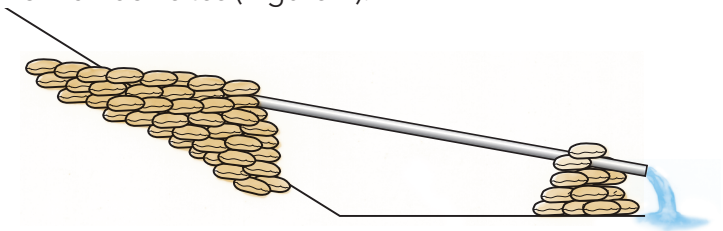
Spillways can be constructed by nailing two 2"x 6" boards together to form a V notch, PVC pipe, two parallel sandbag rows, visqueen, etc.
